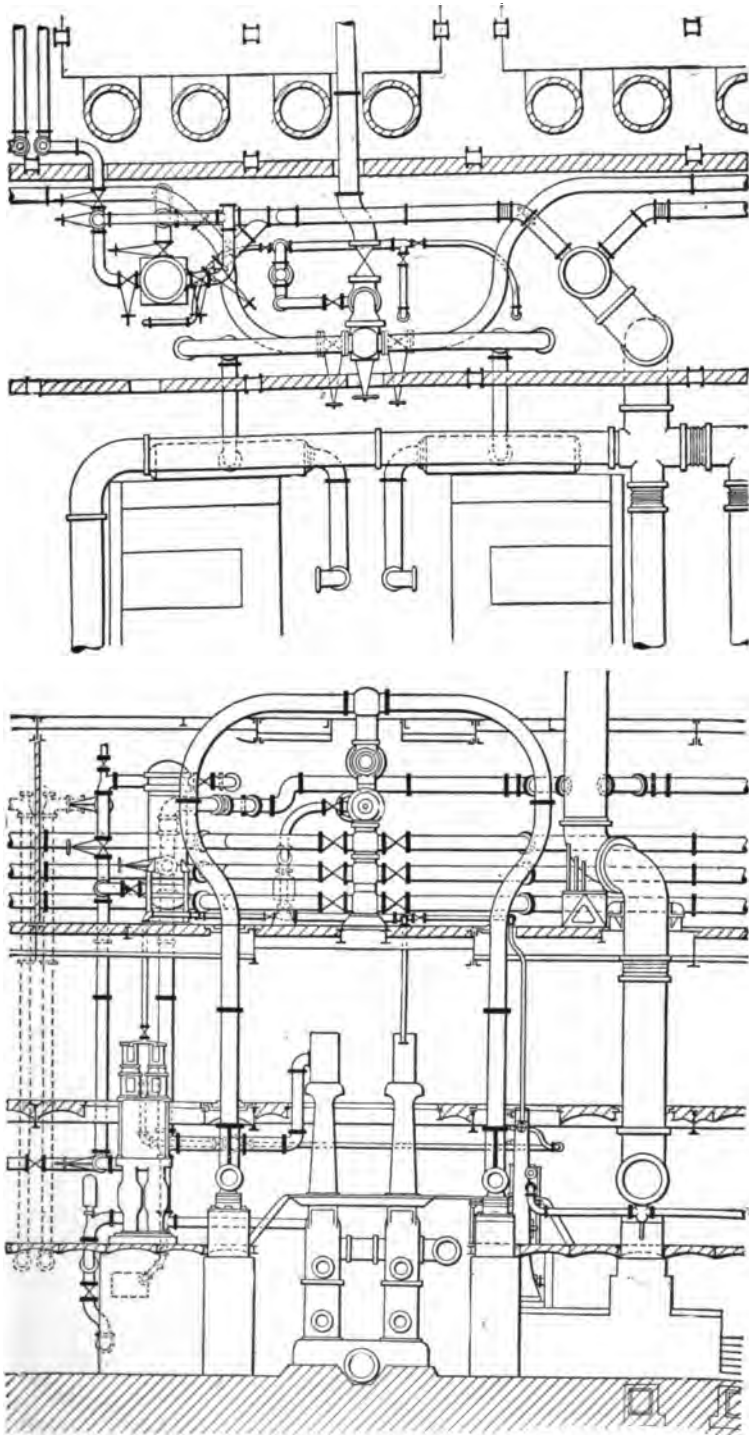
Three-Header Piping System (59th St. Plant, New York).
